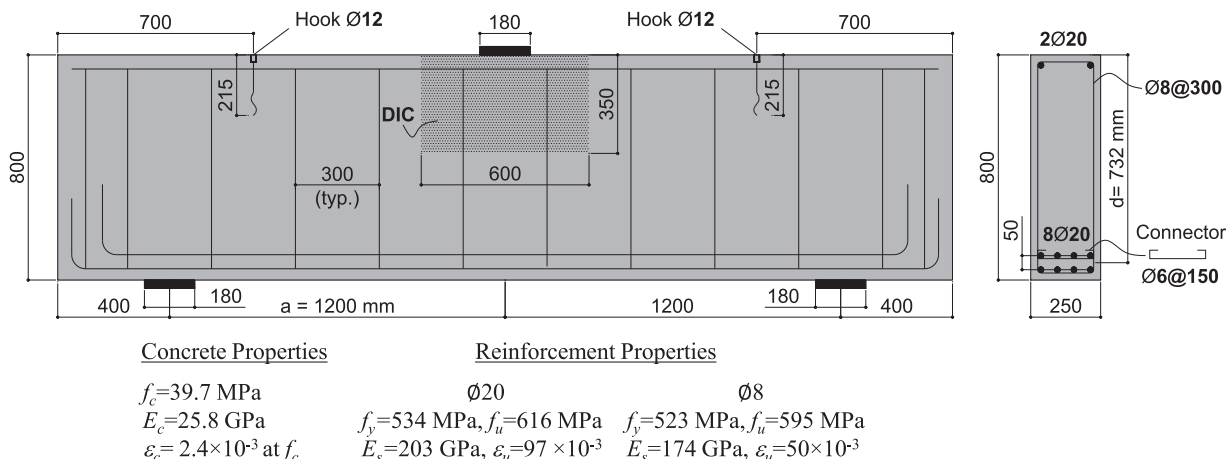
Beam geometry, reinforcement, and material properties of specimen P8.
